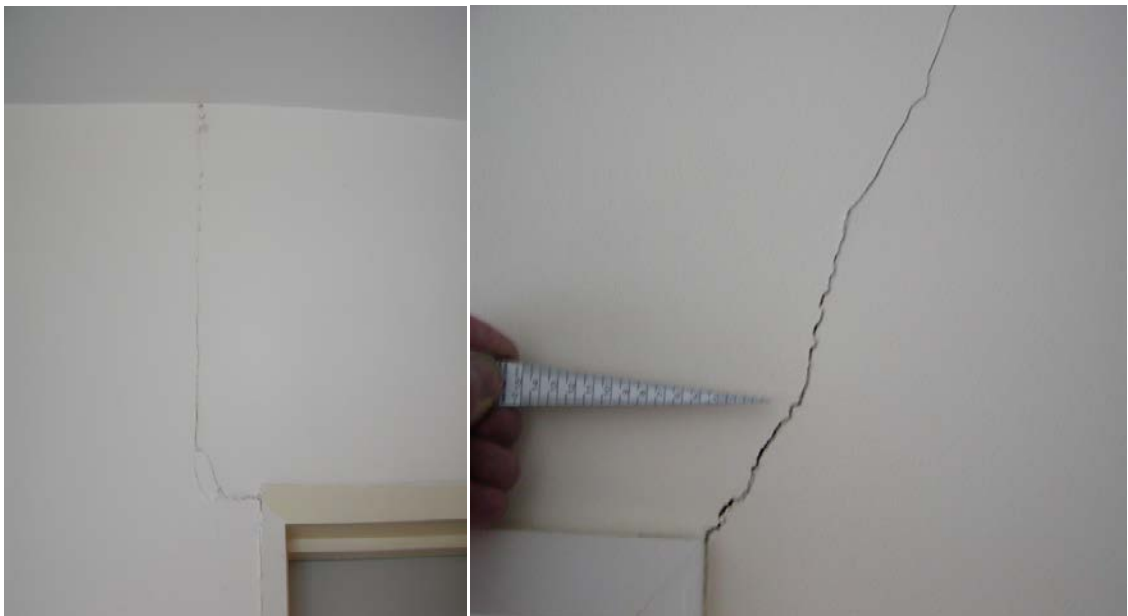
Lining sheets separating on one side and diagonal cracking on the other
